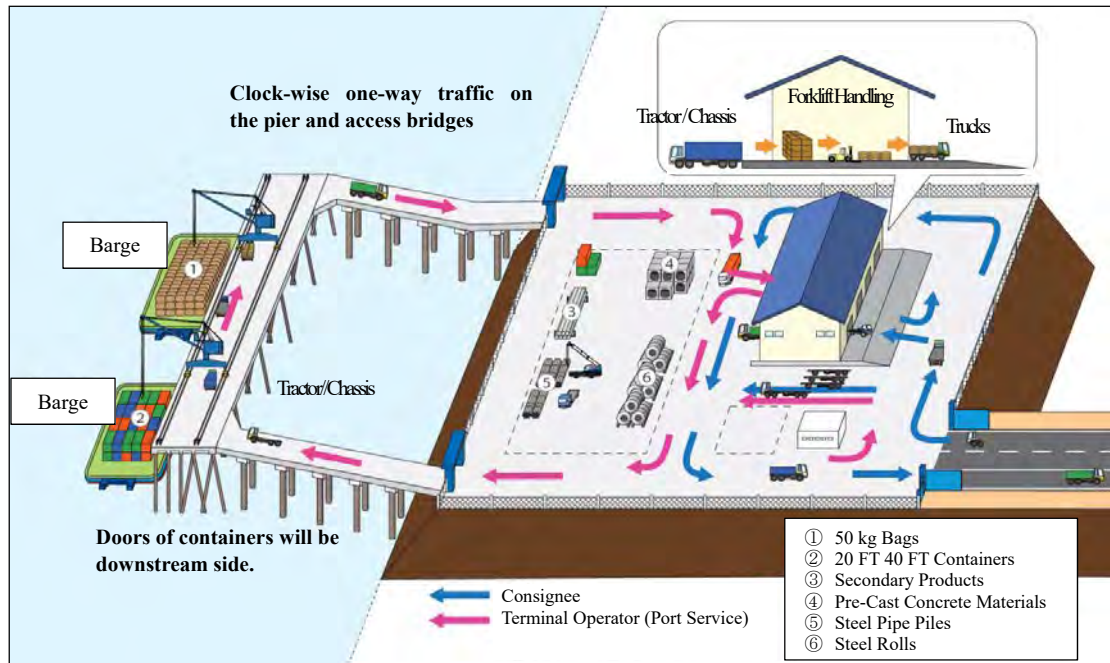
Image of Planned Facilities (Entire Port)
